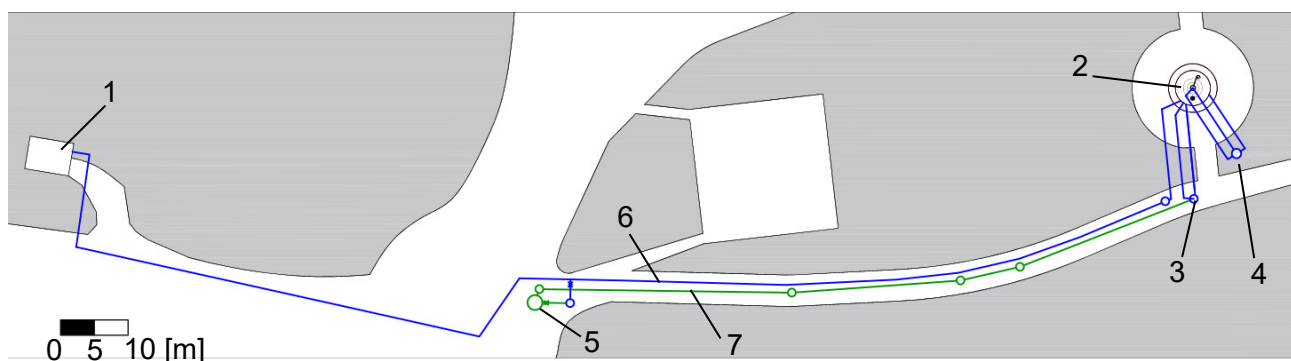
Layout plan of the water supply and sewerage systems of the cast-iron fountain: 1 — public toilet, 2 — cast-iron fountain, 3 — drainage well, 4 — pumping station, 5 — well to pump out wastewater by sewage trucks, 6 — water pipeline, 7 — sewerage system
